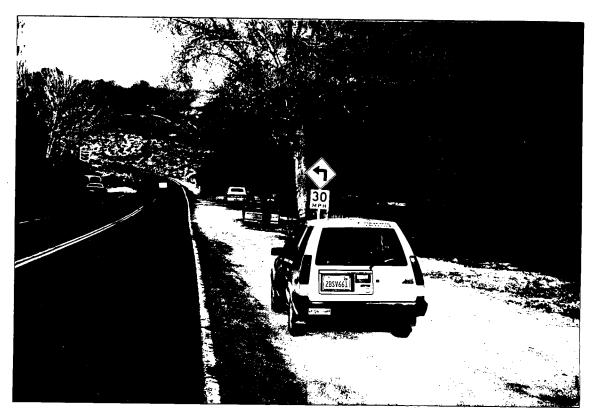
HIGHWAY 120 AND FRONTAGE PARKING
